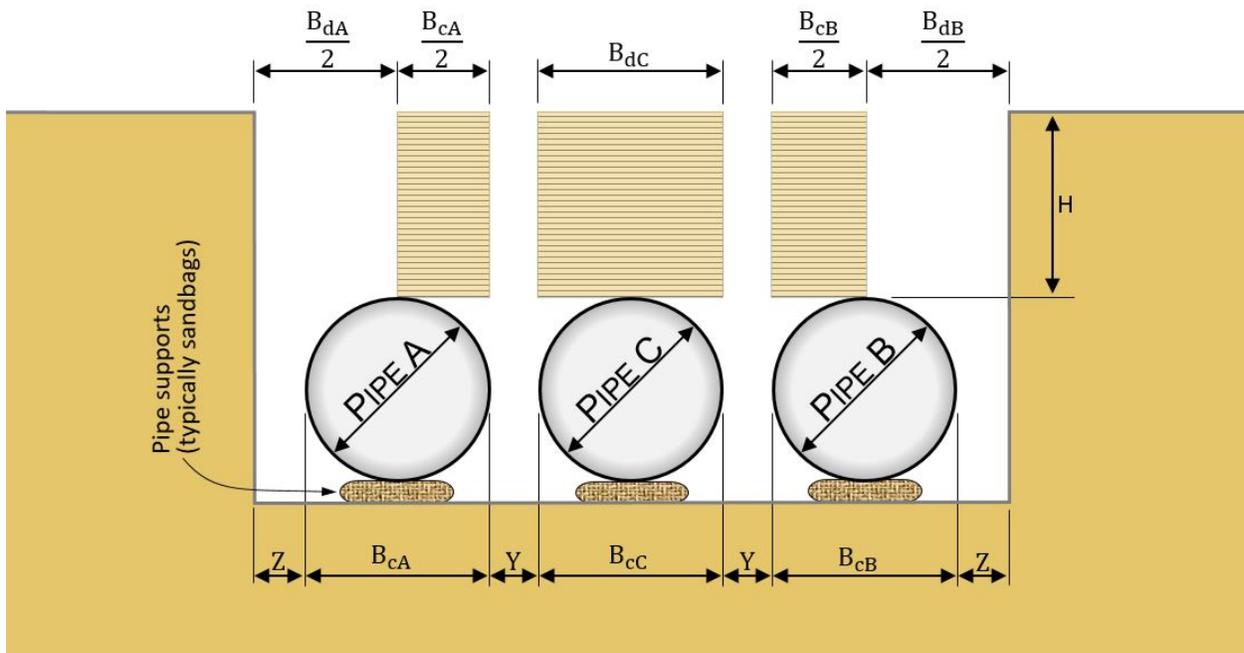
Multiple pipes within the same trench using CLSM backfill.
